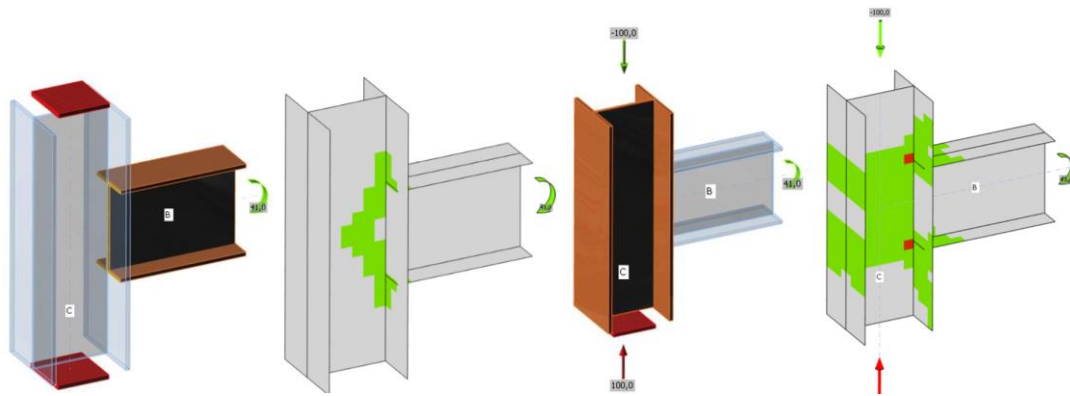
Example of simplified and advanced connection design in Idea StatiCa, advanced with higher utilization to the right and simplified to the left.¹³²
